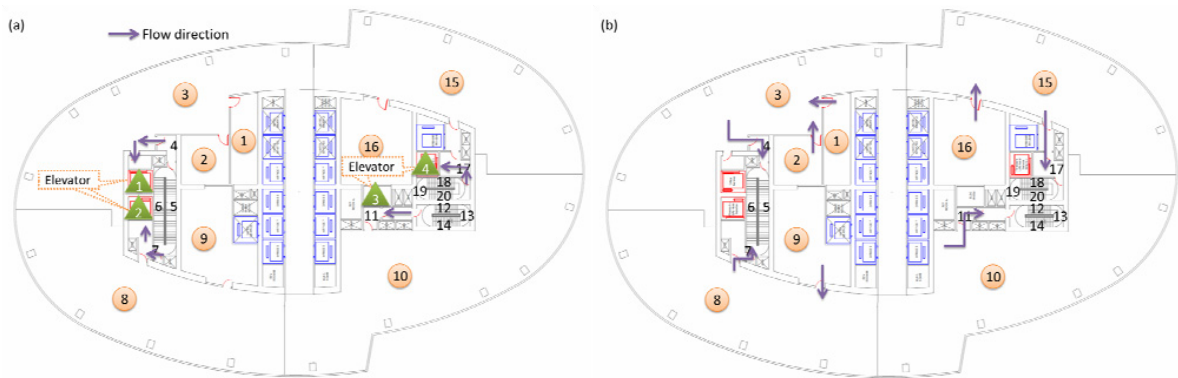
Scheme of the (a) refuge floor and (b) normal office floor as well as the divided regions in the building.
